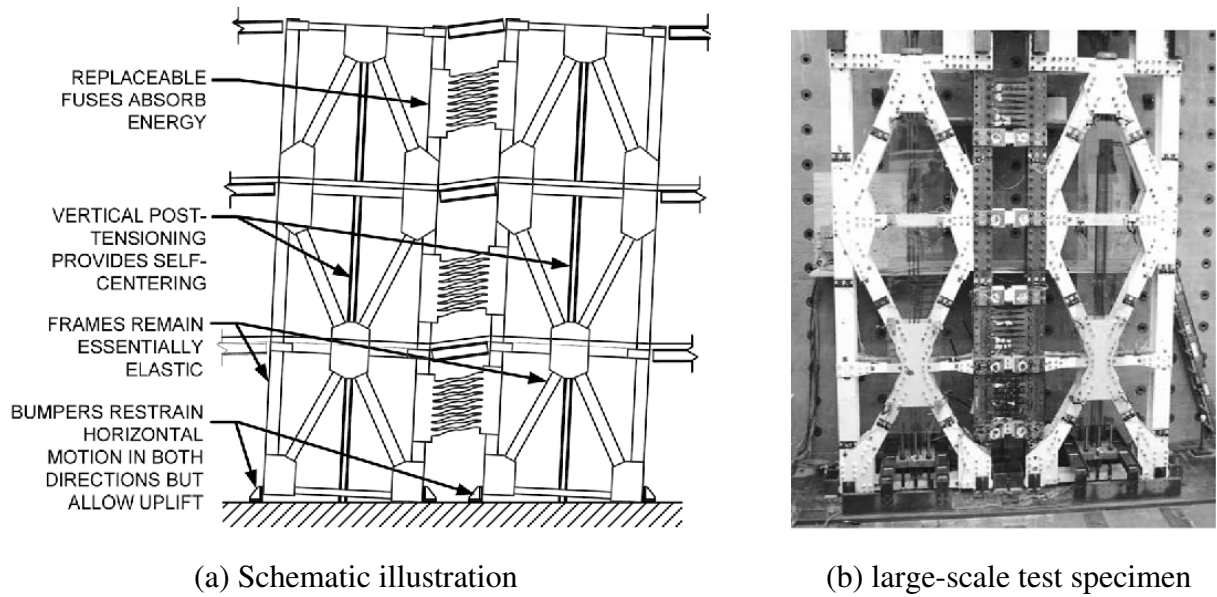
Uplifting rocking frame system with PT strands and steel butterfly shaped fuses [1.23]
